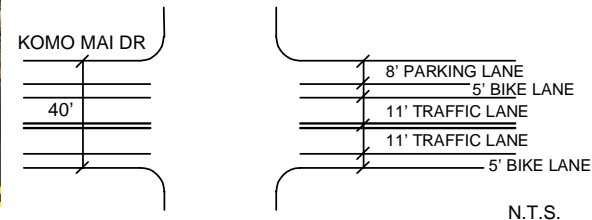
Komo Mai Drive (Ewa of Hoolaulea Street)
